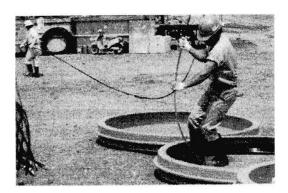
Handling of CFRP 7-wire tendons, courtesy Tokyo Rope Mfg. Co.
